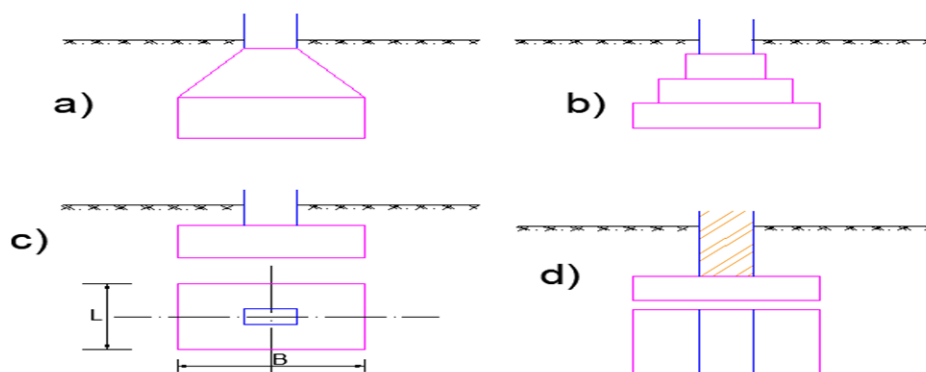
Some types of shallow foundations: a) plain concrete foundation b) stepped reinforced concrete foundation c) reinforced concrete rectangular foundation d) reinforced concrete wall foundation[17]
